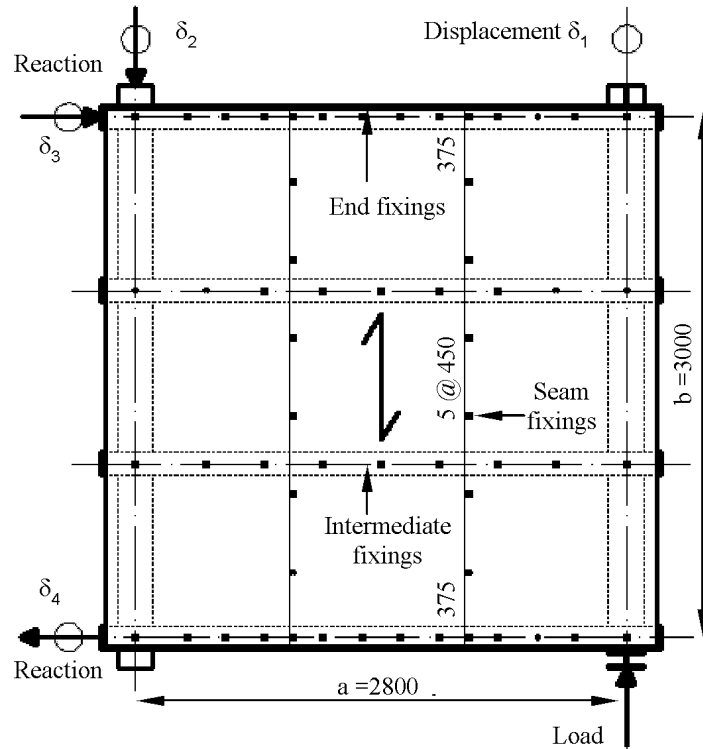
The single skin diaphragm fixed on 2 sides - test arrangement
